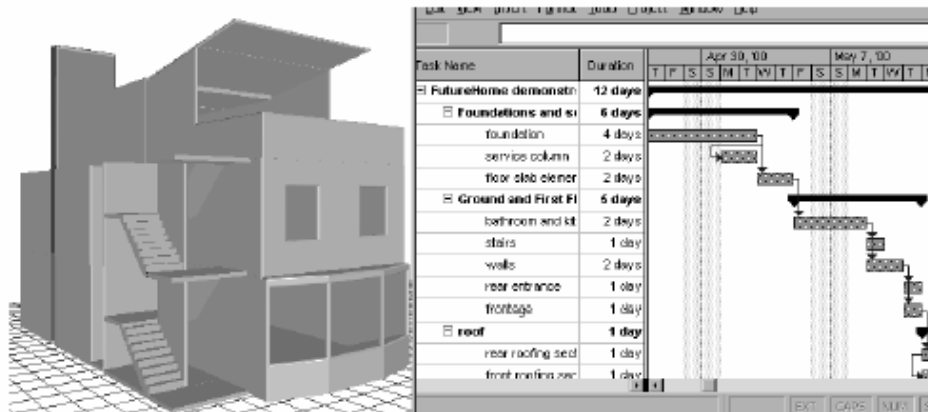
A building constructed in the virtual environment and its construction schedule (Murray, Fernando and Aouad, 2000).
